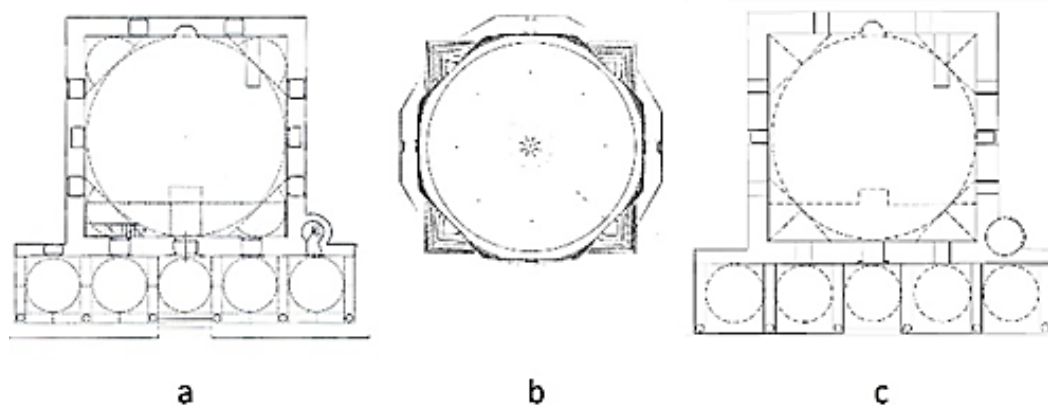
Plan drawings a. Drawing from publications [22], b. Horizontal sections from point cloud c. Plan drawing with the help of sections.
